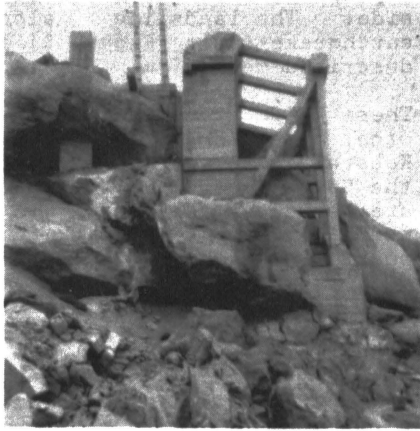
Rockfalls and the earthquake fault induced slides near the Sefid-Rud dam. The foundation of the tower crane of dam and its retaining wall is obvious.
